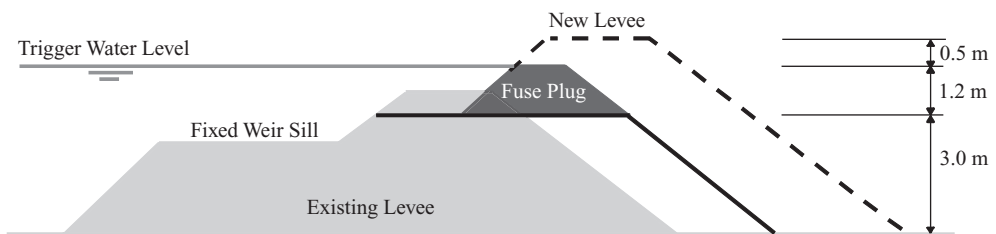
Dam cross section along the side spillway section with planned fuse plug.
